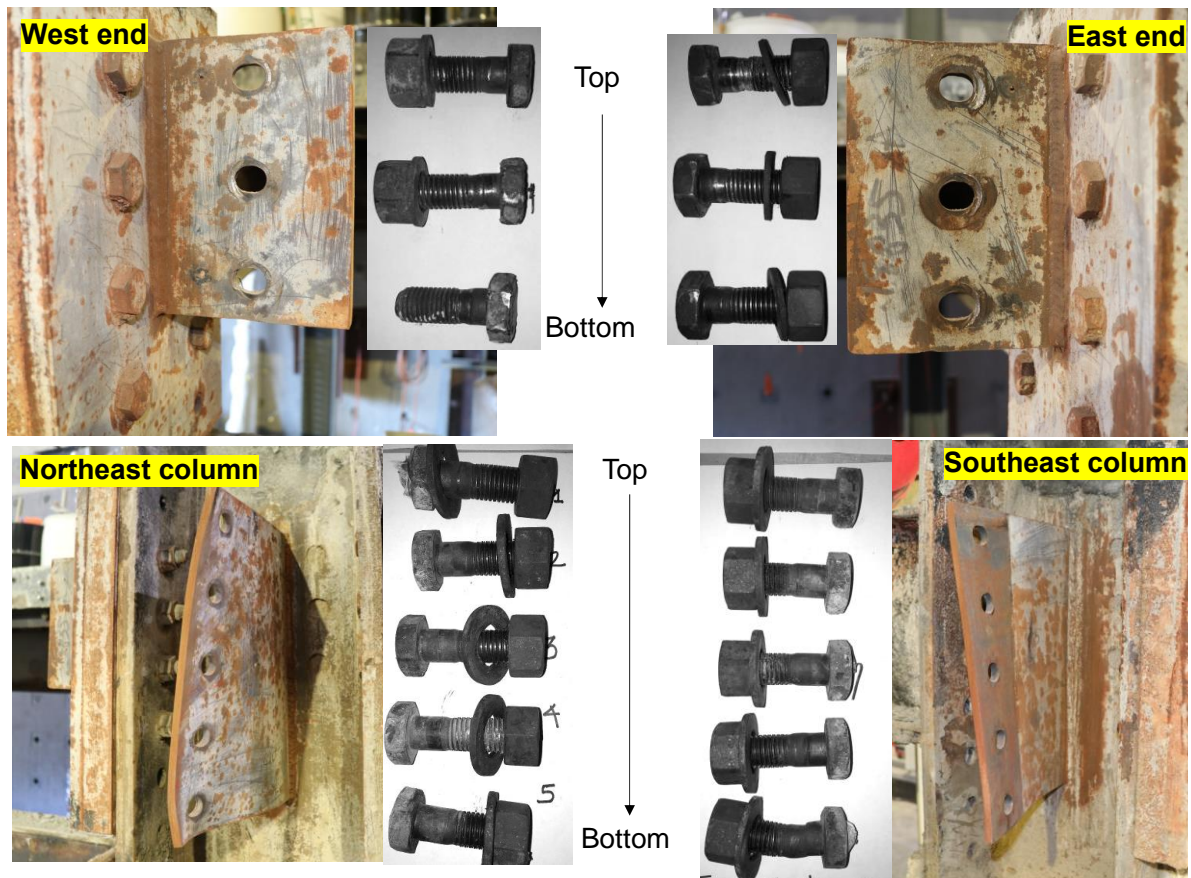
Post-test photographs of the standard shear tab connections of the north edge beam (top) and the extended shear tab connections of the east girder (bottom).
